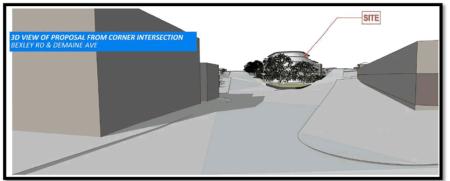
3D Views of Planning Proposal (Source: Proponent's Planning Proposal)
